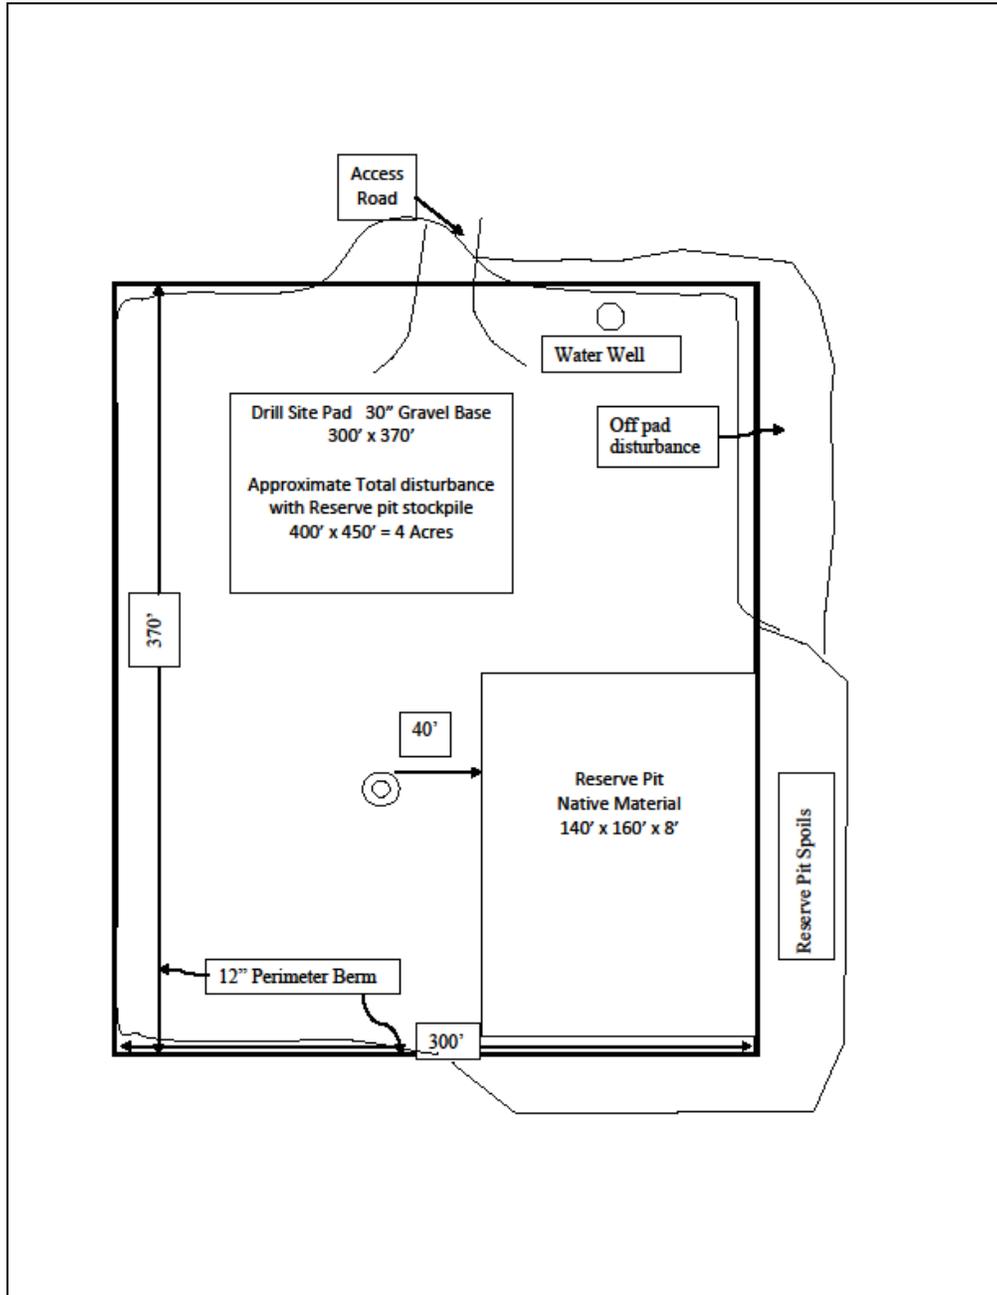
Proposed well layout diagram for BSEM 1-14 well
